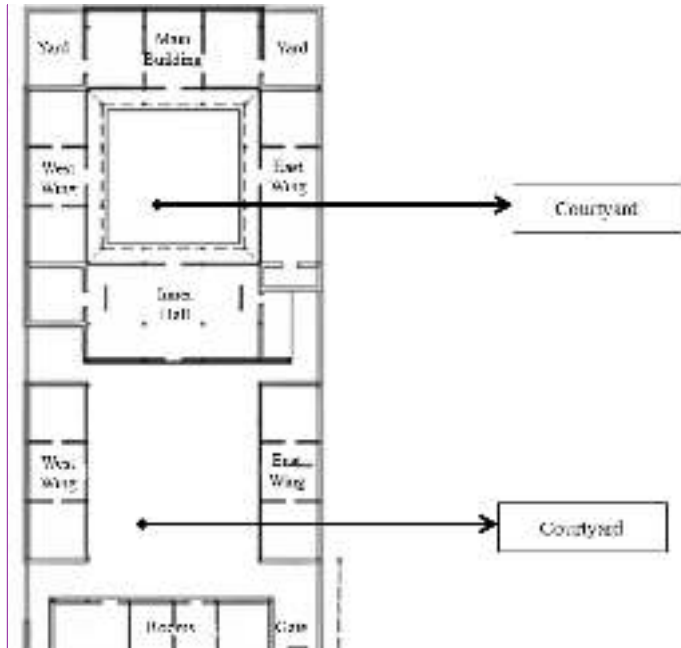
Traditional Chinese Building Floor Plan. (Source: Handinoto, 2008)
